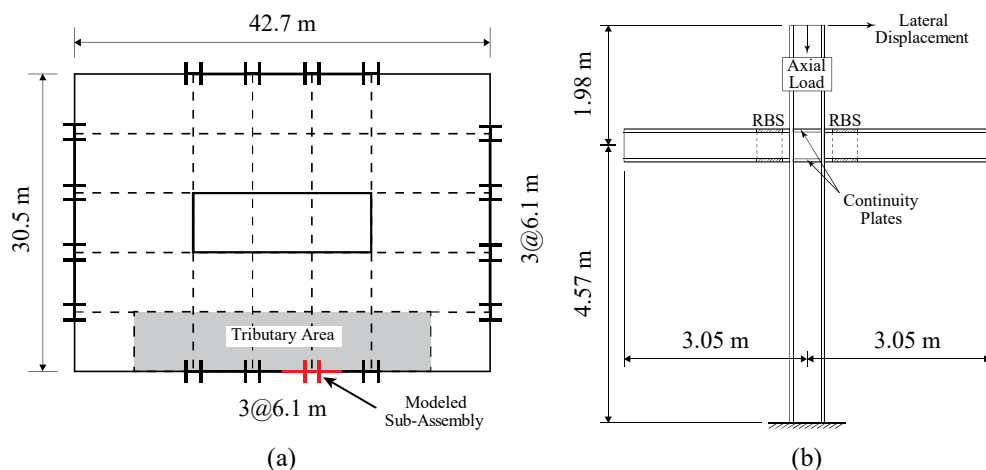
(a) Typical building plan configuration and (b) schematic of the wide flange column sub-assembly
